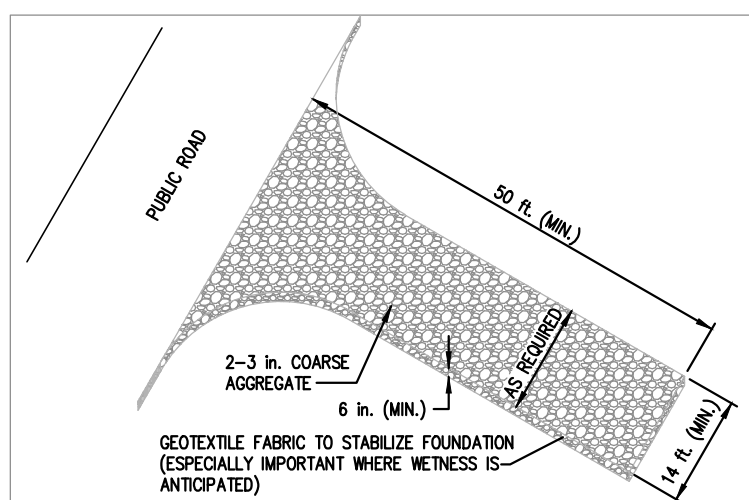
B. Plan of a temporary gravel construction entrance/exit pad.
